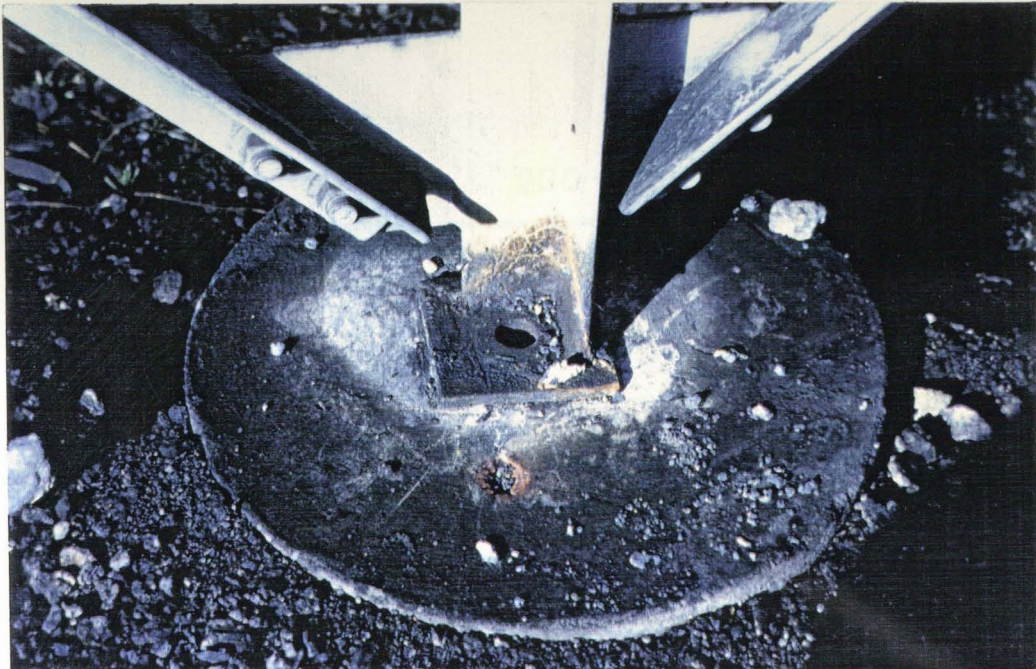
The leg of the conveyor belt structure after the bolt attaching it to the concrete foundation block had been cut loose.
